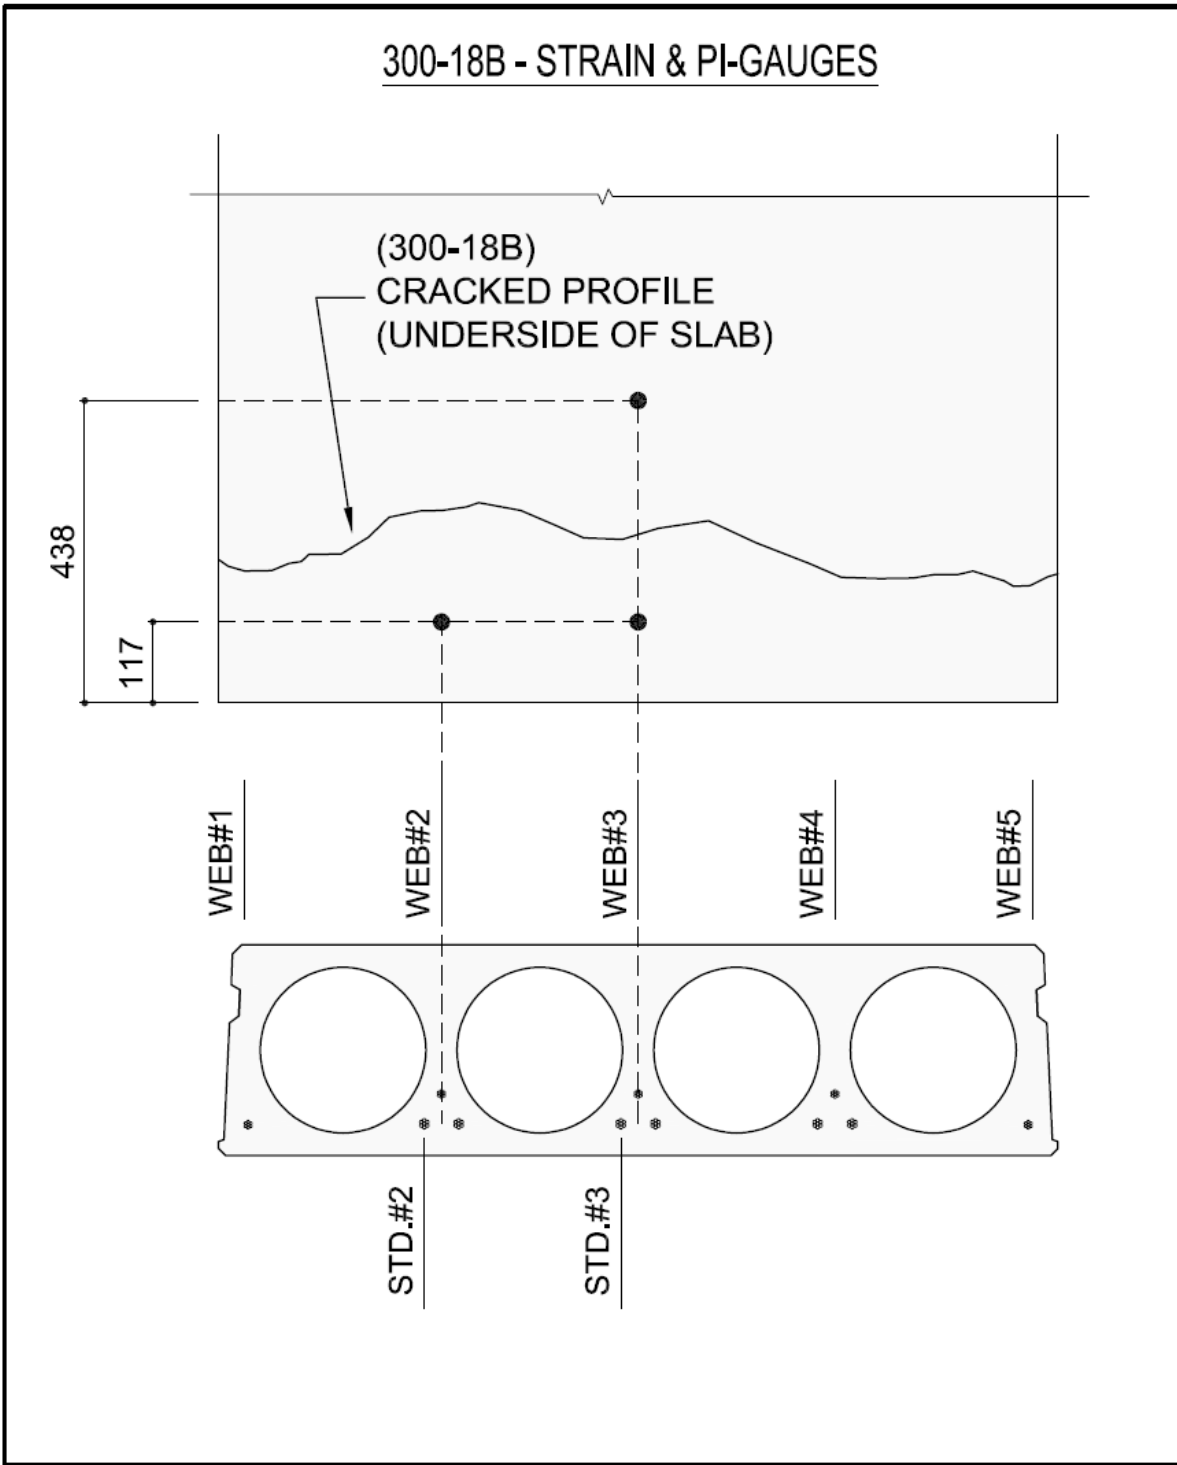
Plan View of Gauges and Crack Profile at Slab Underside (Slab 300-18B)
